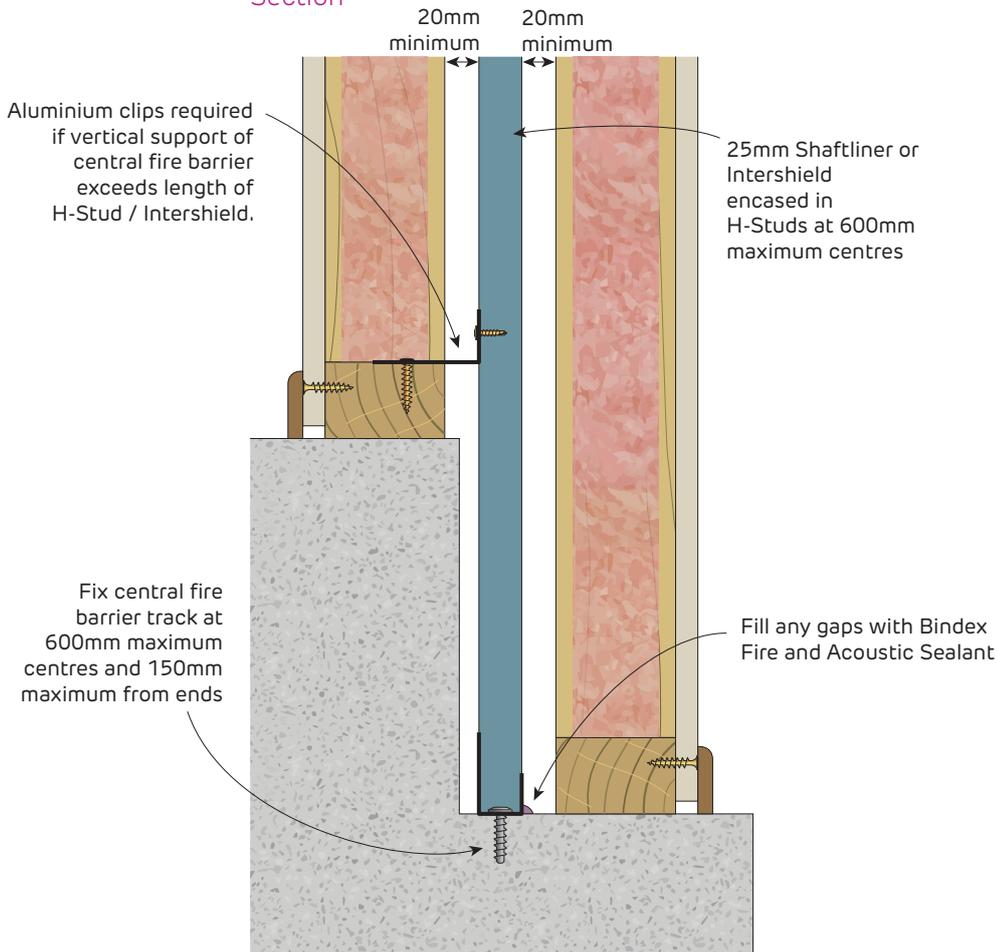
Interhome Wall Base to Slab with Larger Step-Down
